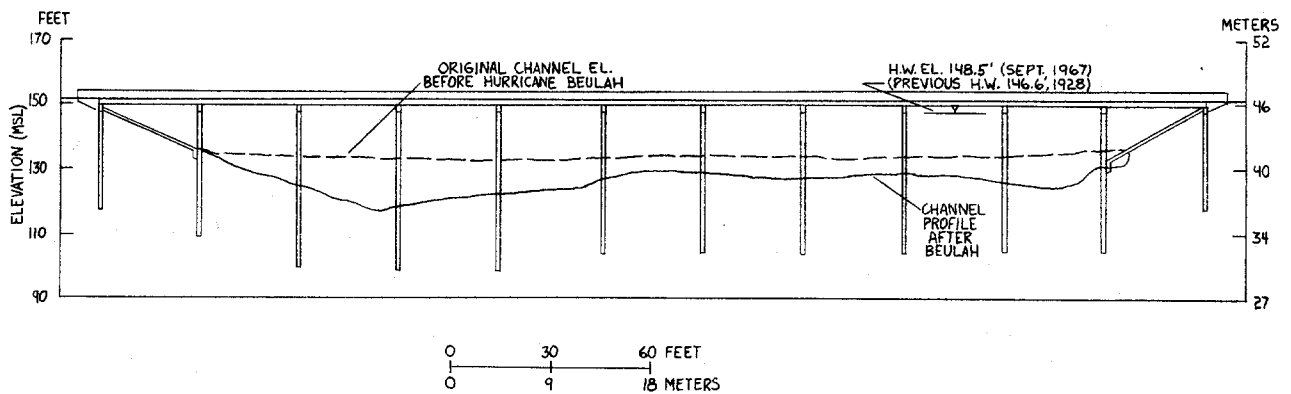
Cross section of overflow channel before and after flooding in September 1967.
